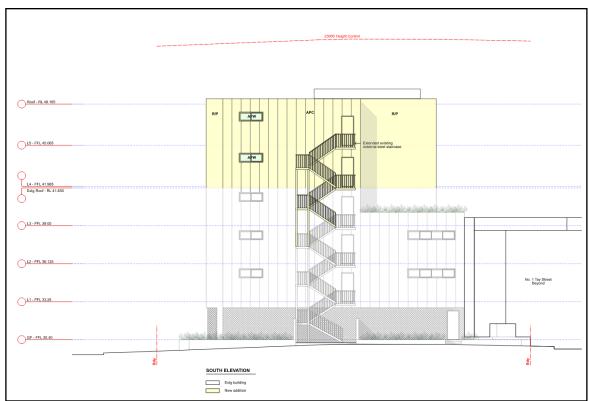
Southern Elevation fronting Tay Lane for 2 Anzac Parade, Kensington (Source: Applicant)
